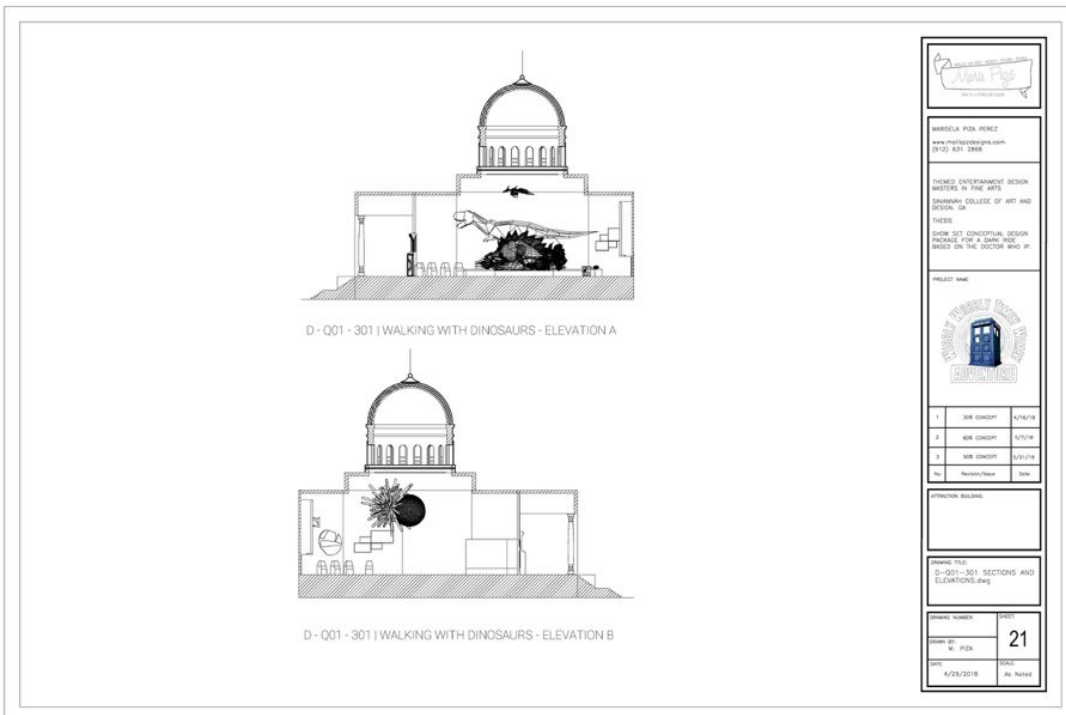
D-Q01-301 | Walking with Dinosaurs - Sections and Elevations
